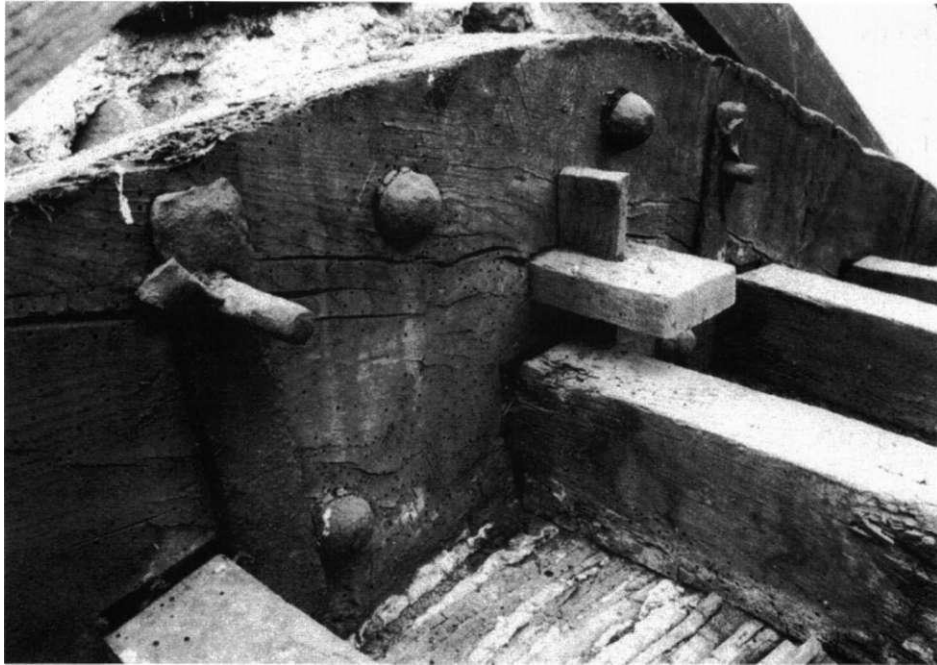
Chancel truss 3: detail of scarf joint fixings
